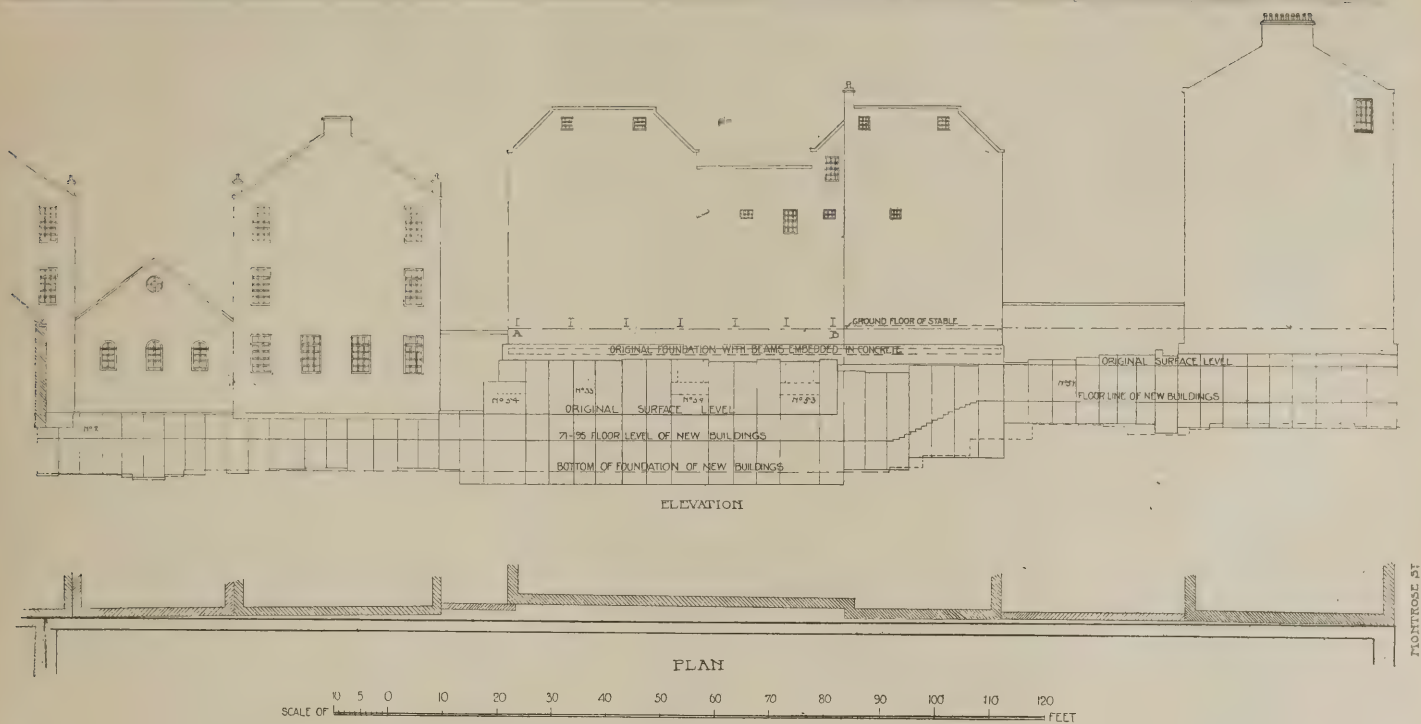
UNDERPINNING OF BUILDINGS ADJOINING NORTH WALL.
